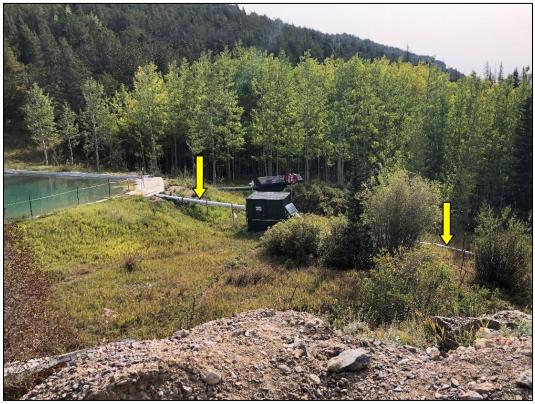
View looking southeast showing discharge pipeline (indicated) from southern corner of Pond 2 to Coon Track Creek where combined mine water is discharged under NPDES permit. Note two discharge sheds located south of pond, newer shed in front.
